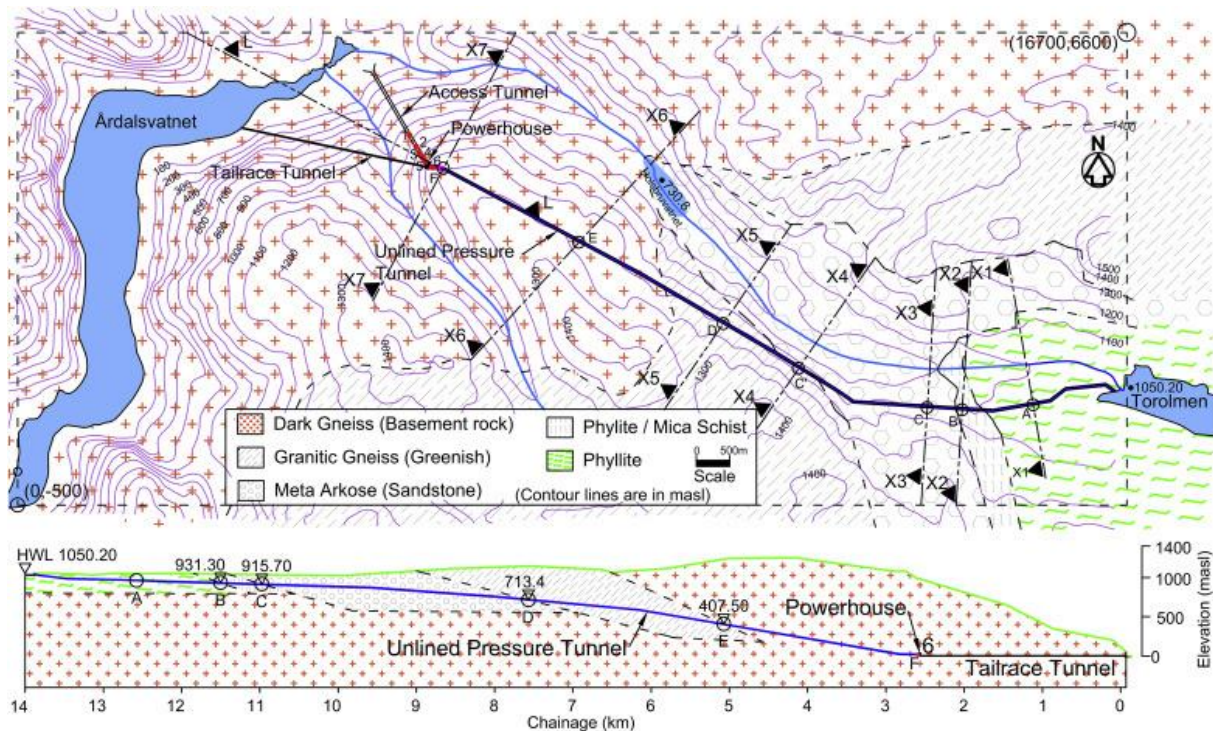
Overview of Tyin HEP with topographical and profile view of tunnel alignment (Basnet and Panthi, 2018)
